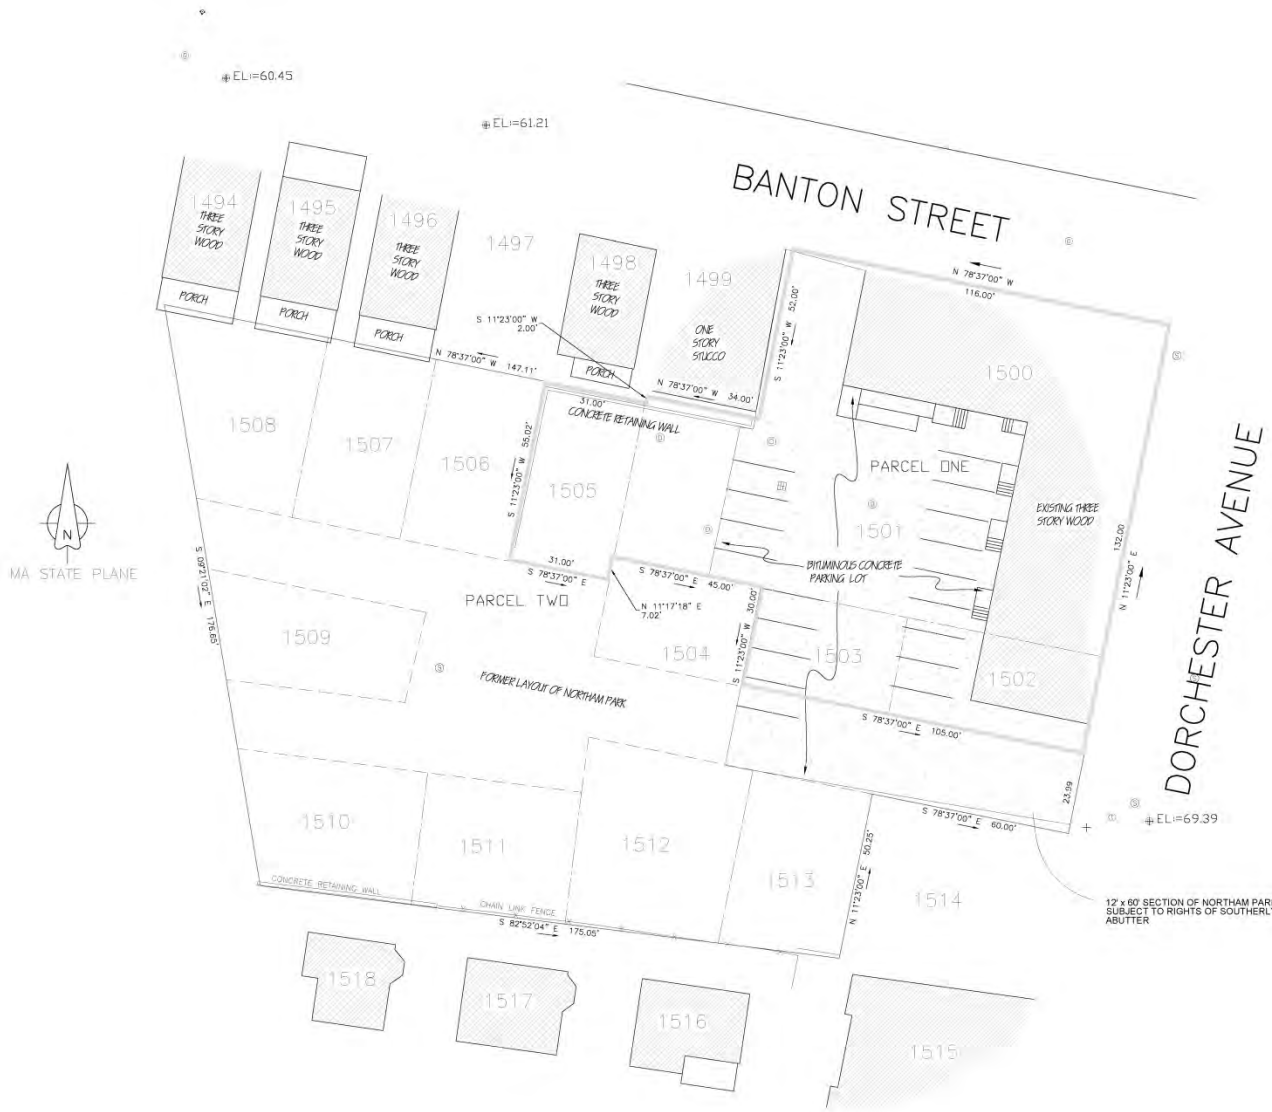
Exhibit D: Renderings, Site Plan, Floor Plan, Building Elevations
